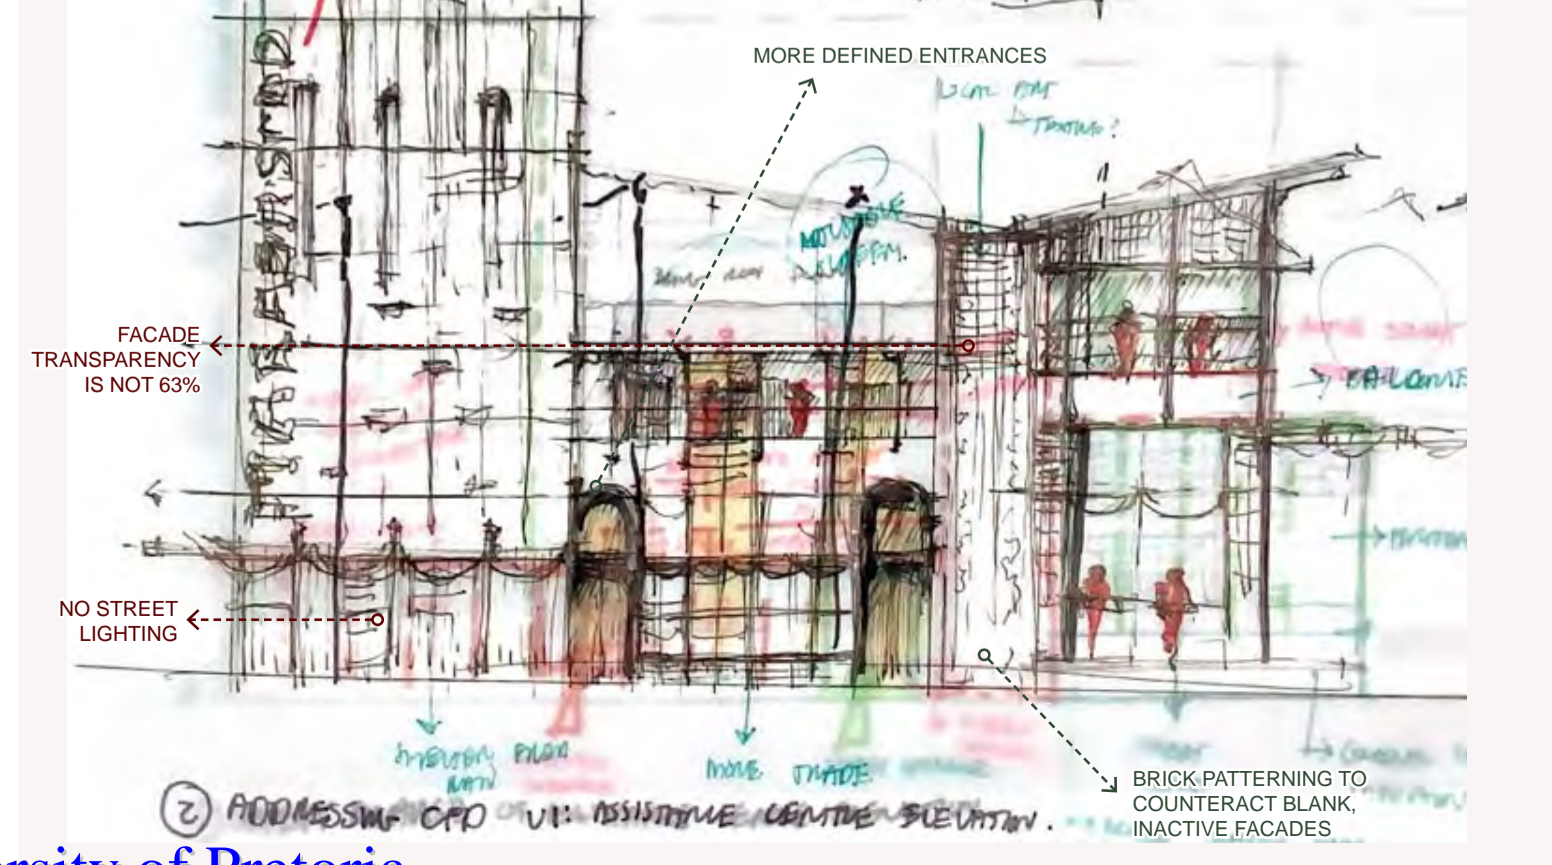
ELEVATION EXPLORING REFINING THE FACADE OF THE ASSISTANCE CENTRE (AUTHOR, 2023)
